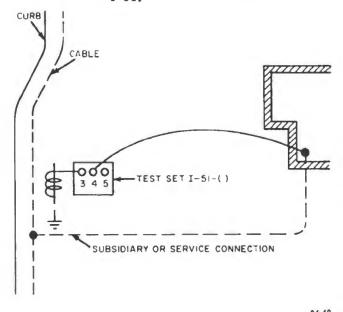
Tracing accessible conductor with test set I-51, and one ground rod.
